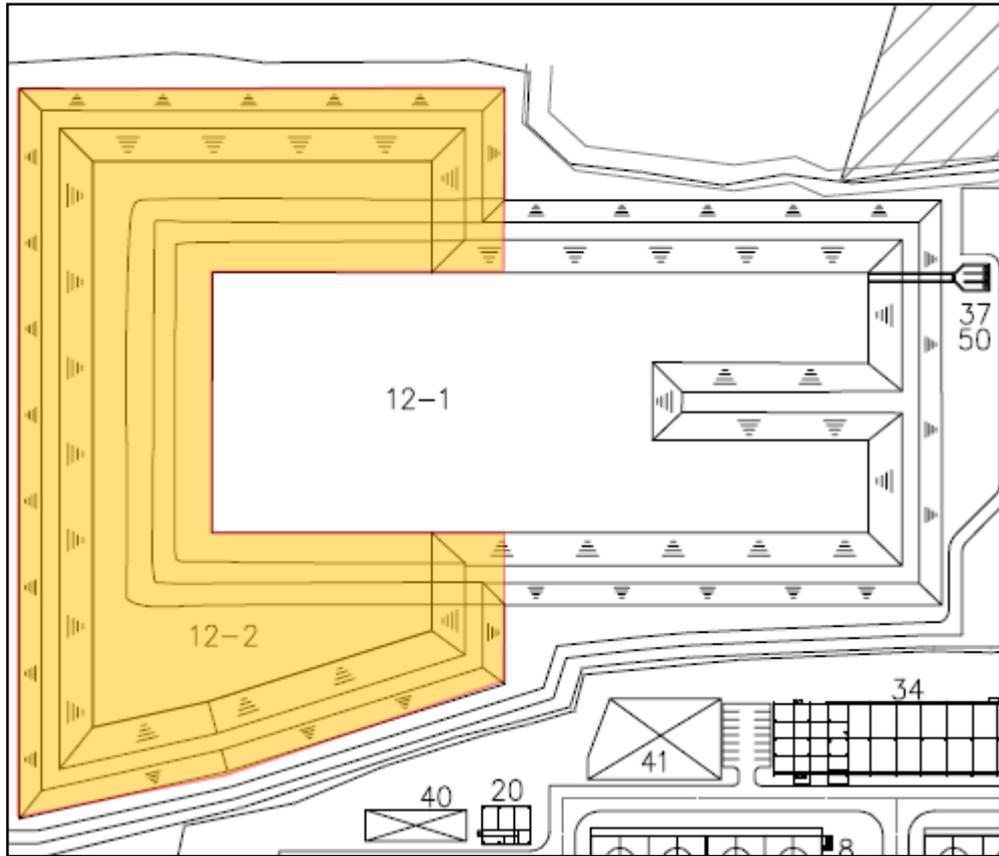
Indicate Boundary for further expansion of the Raw Water Pond for the Power Plant
